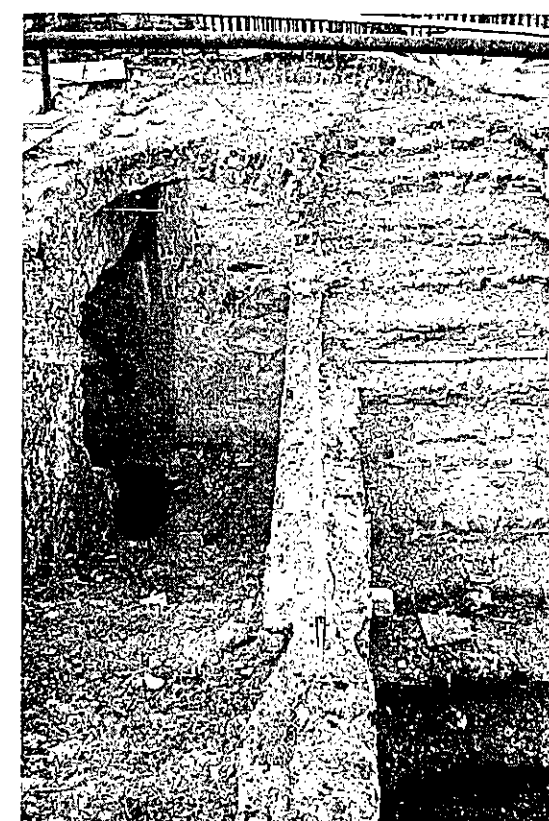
West end stairs. Note that both staircases lead to the basement, the arch and the dividing wall between the stairs.
